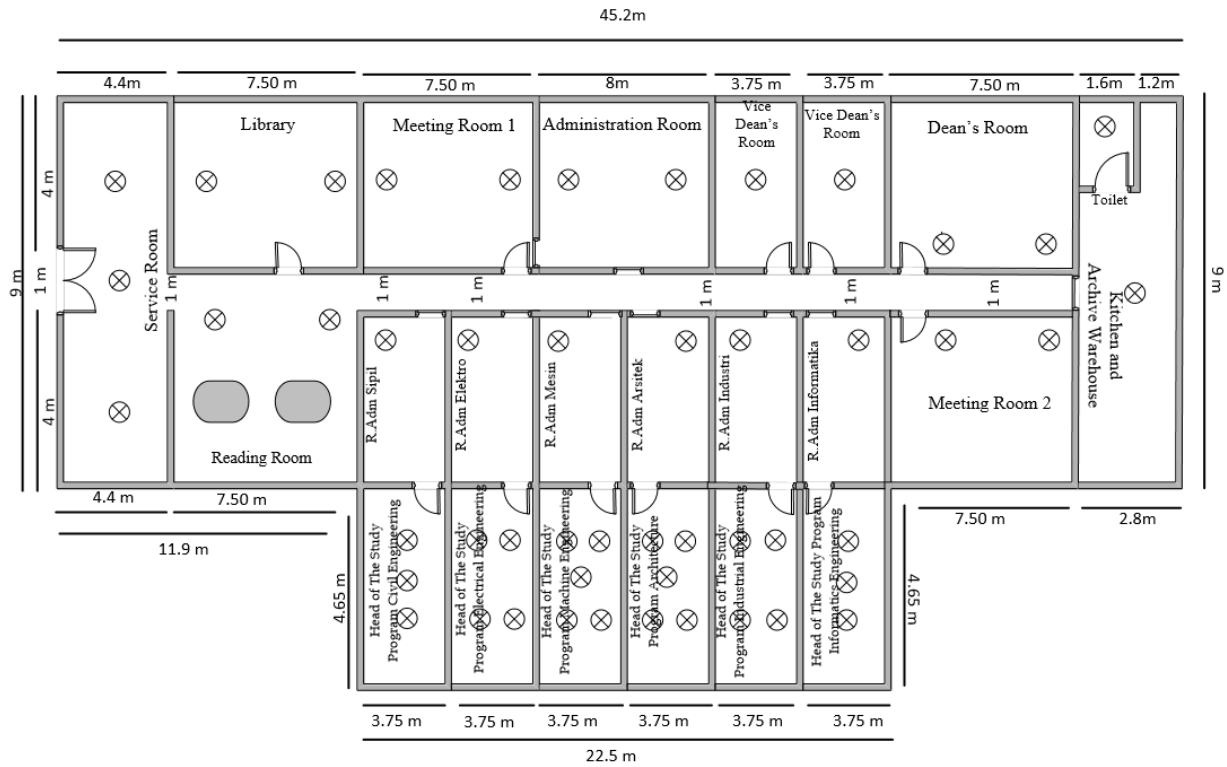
The Layout of The Light Points for the 1st Floor Room of Faculty Engineering, Universitas Medan Area
